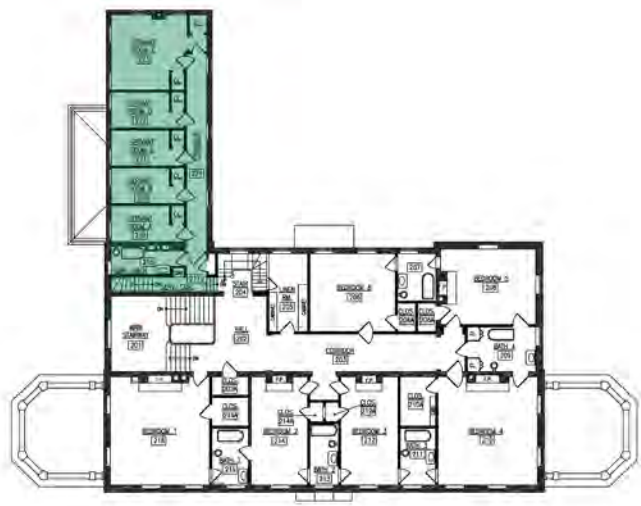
Second floor plan showing the location of the servant's spaces. (HA, 2015)
